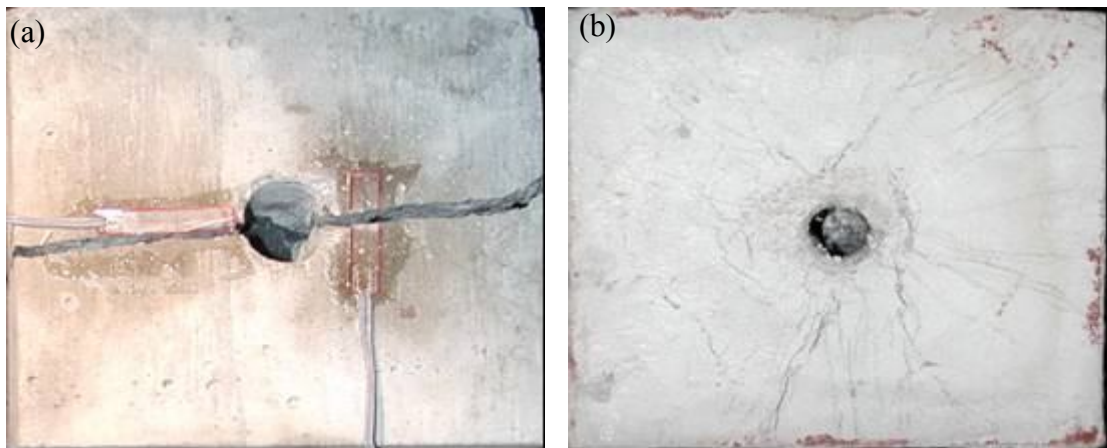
Failure modes of the slab (a) concrete, and (b) ECC
